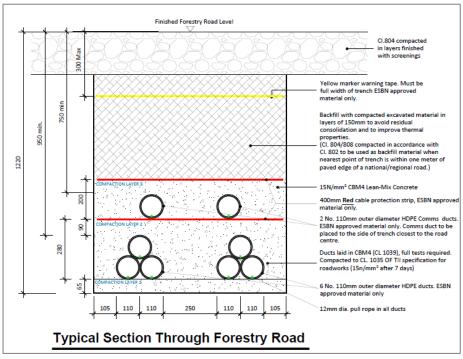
Typical 38kV Double Circuit Trench in Forestry Road Section
